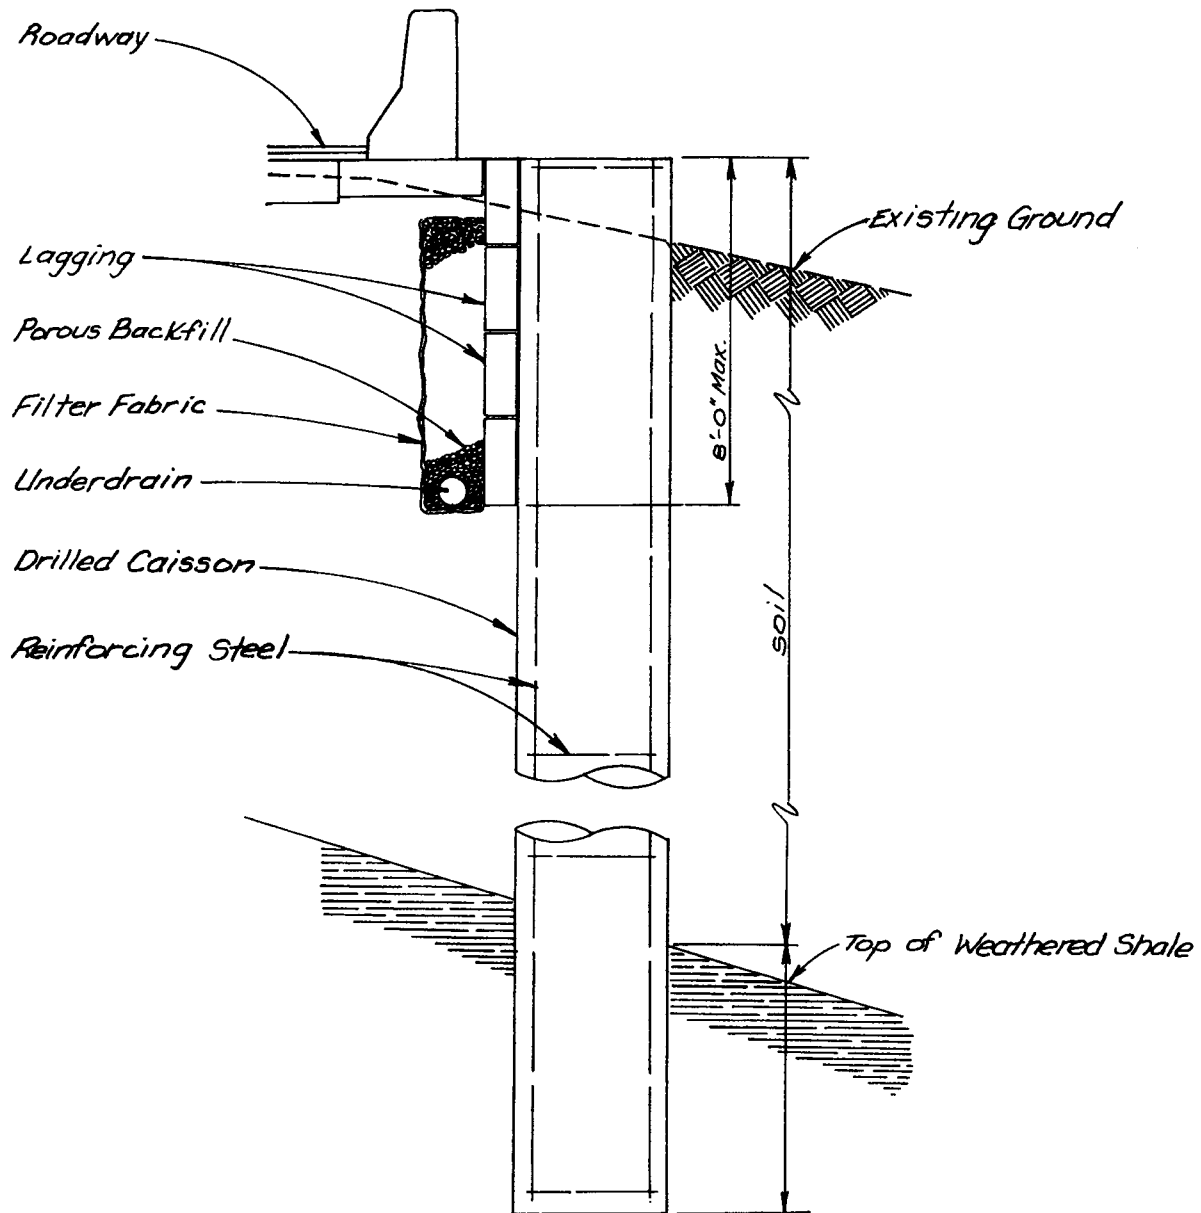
Design of a typical cantilevered pier wall used to support potentially unstable slopes in the Cincinnati area. Pier walls are constructed by drilling large diameter holes into bedrock, which are in turn filled with reinforced concrete. When completed, each pier acts as a lever to prevent the colluvium from moving downslope.
